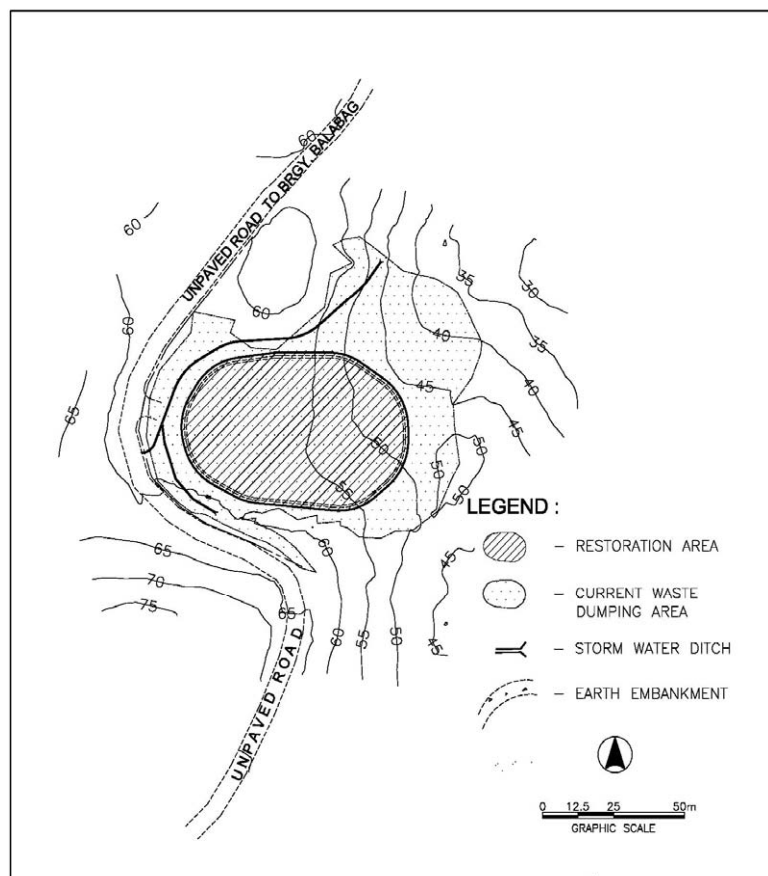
Rehabilitation Plan for the Old Dump Site
